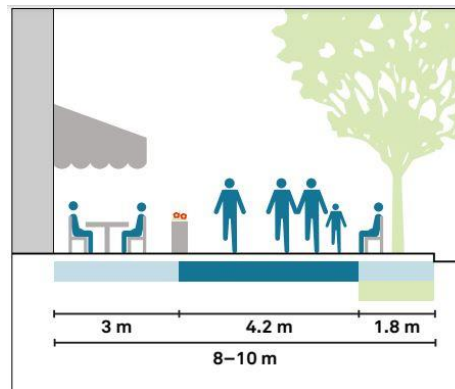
Standard width (Source: (*Global street design Guide*, 2016))
